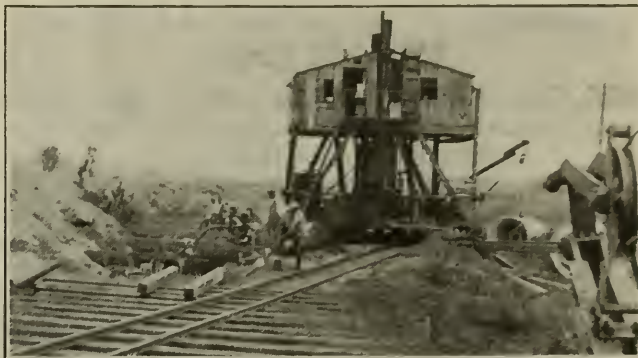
PIPELAYING MACHINE CROSSING A RAILWAY
